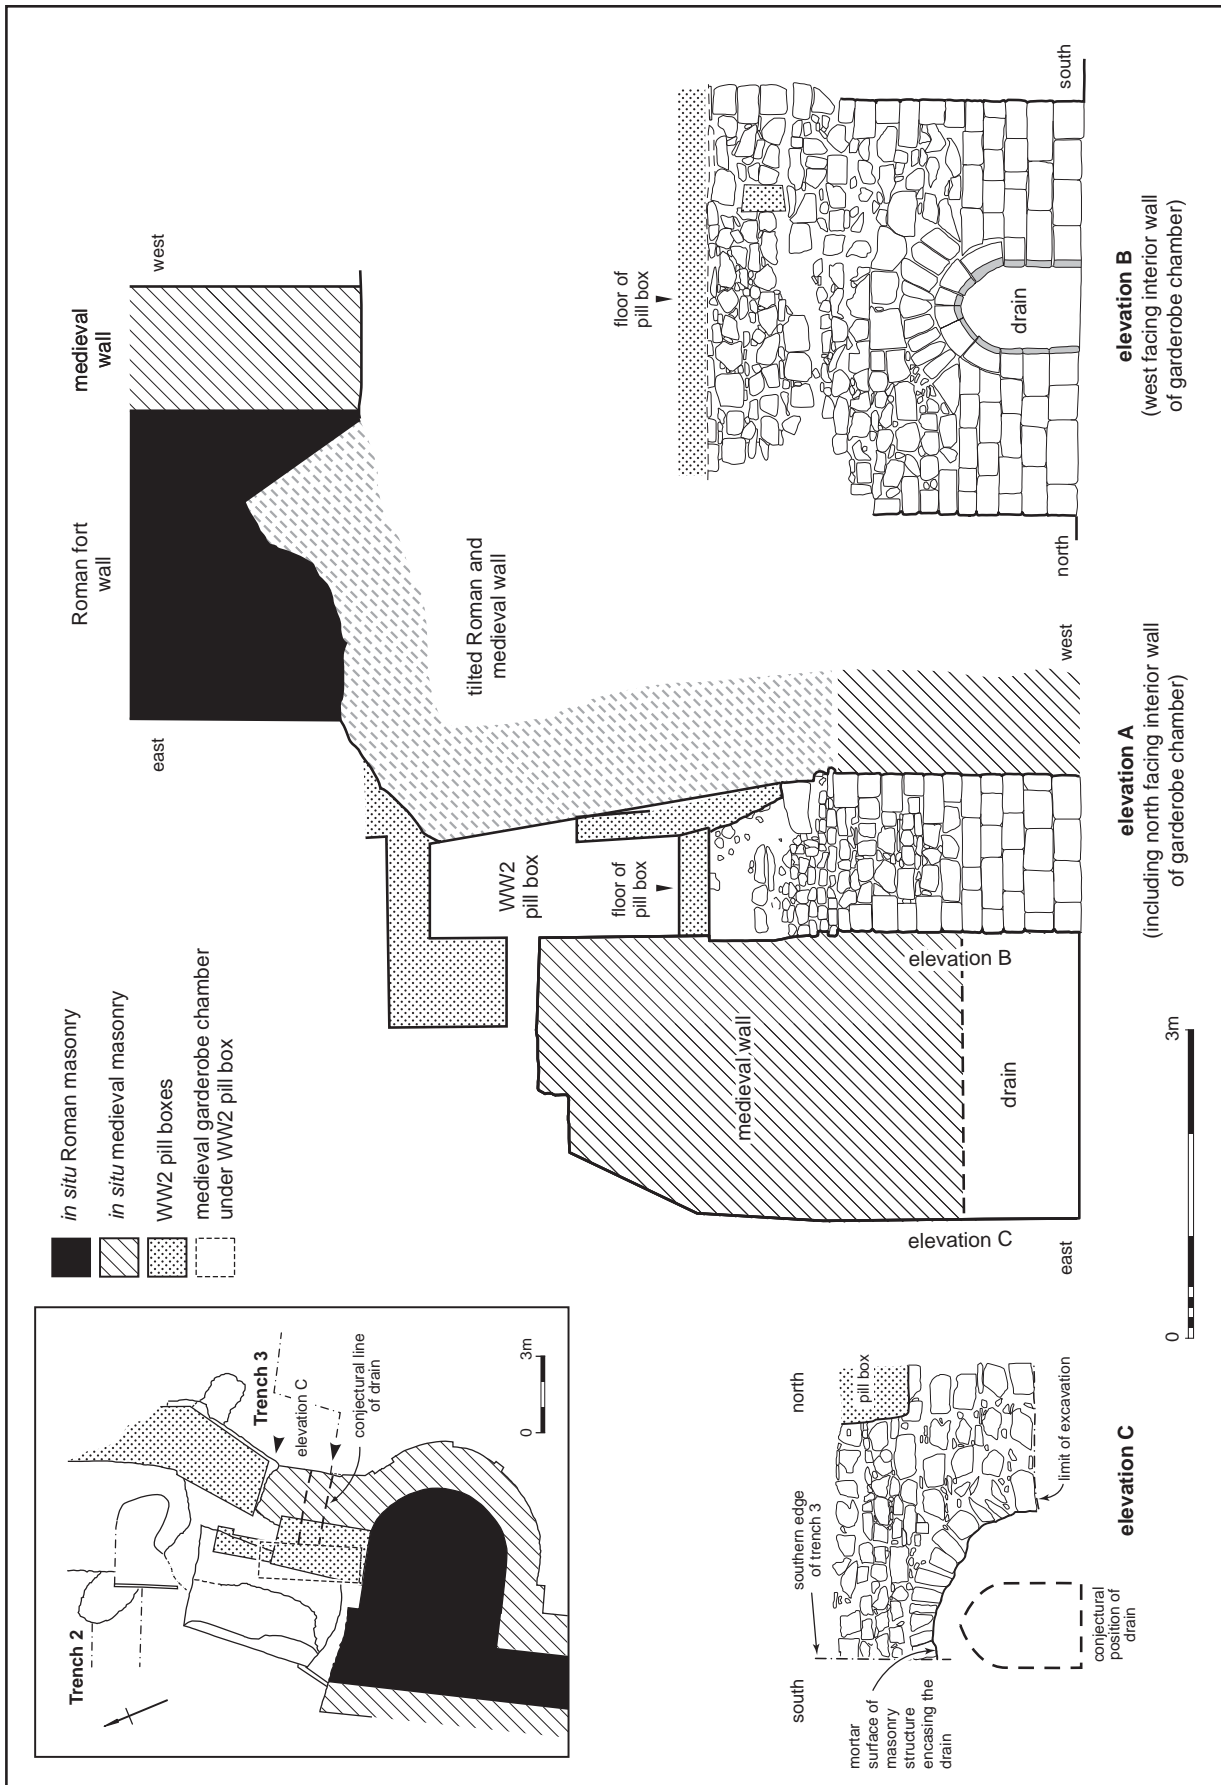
East-west section through the garderobe block, and elevation drawings from within the garderobe chamber (elevations A and B) and its outer, east face (elevation C)
